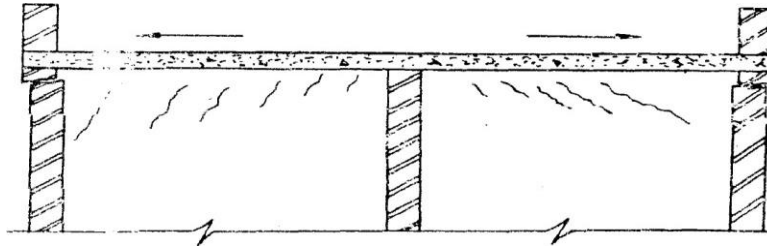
Cracking in cross walls of top most Storey of a load bearing structure
